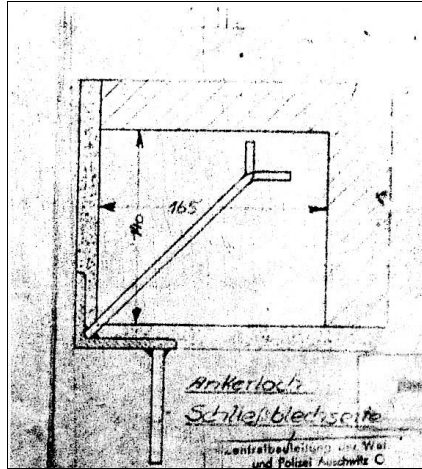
Blueprint of the wall anchor for a frame of a sturdy, gas-tight steel door.
